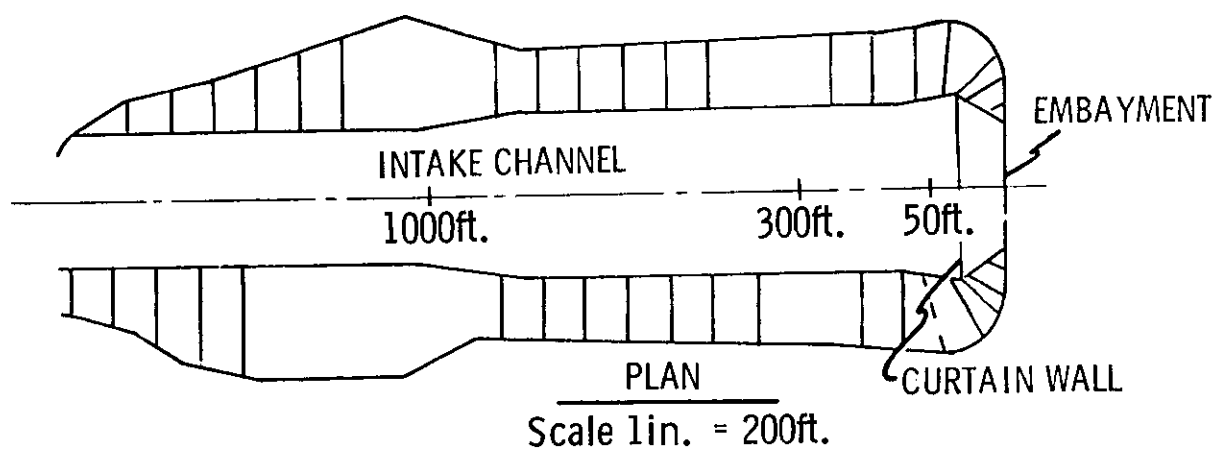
Plan view of intake channel, curtain wall, and intake embayment.
